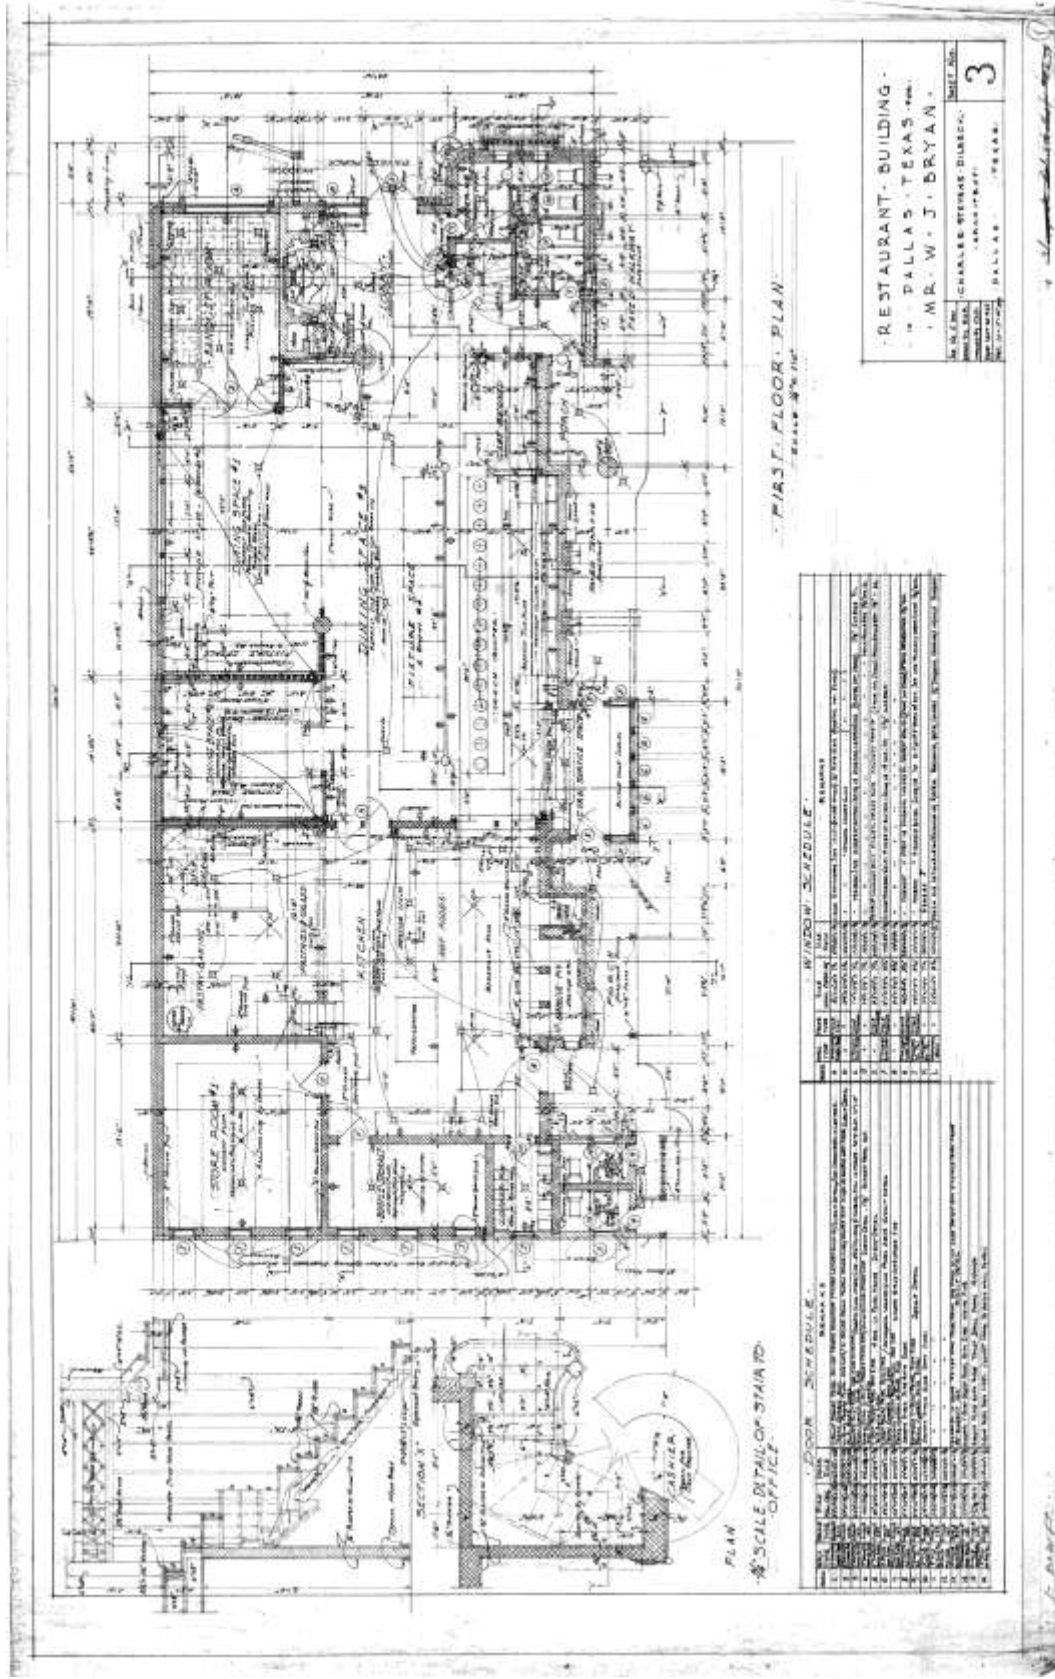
Original architectural drawing by Charles Dilbeck – First Floor Plan. Courtesy of Willis Winters, FAIA.
